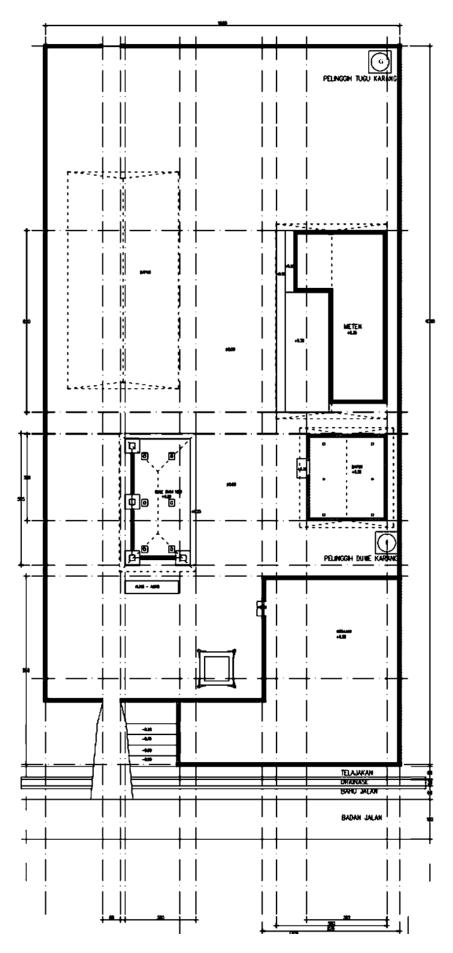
Layout Plan of Traditional House Krama Adat Pekarangan.
